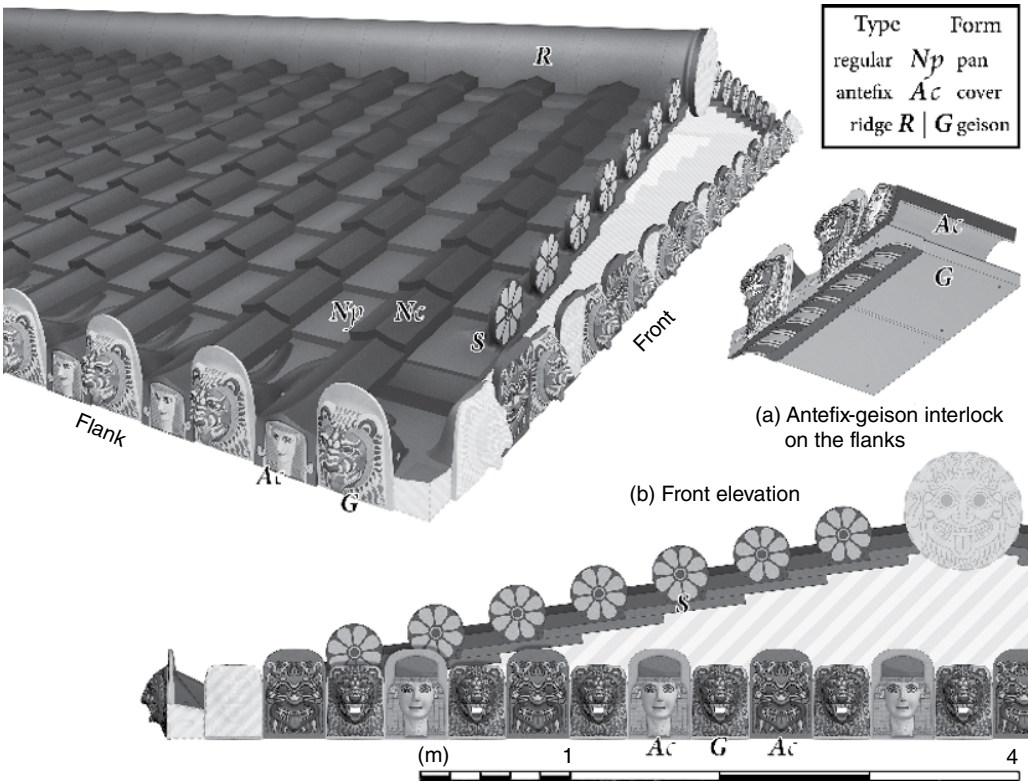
Mon Repos, Corfu, Northwest Greek roof, schematic reconstructions. (The restoration of hatched areas is uncertain. The original width of the roof was greater than 13 tiles.) *Source:* P. Sapirstein.
